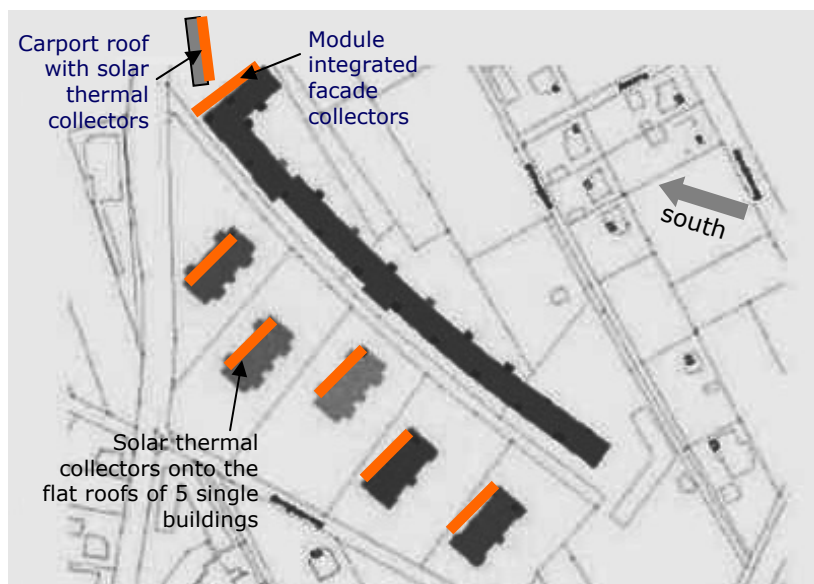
Site plan showing the solar thermal collector areas. (Source site-plan: Hohensinn ZT GmbH)
